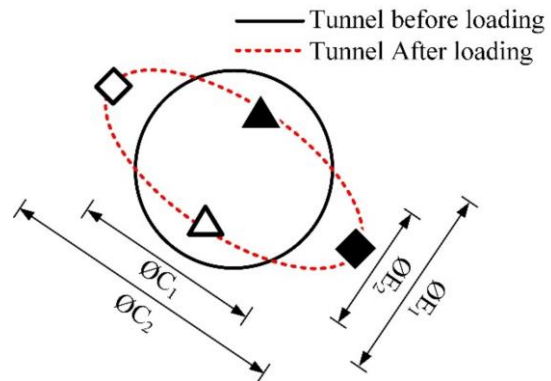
Positions to observe the structural forces in tunnel lining and tunnel deformations
